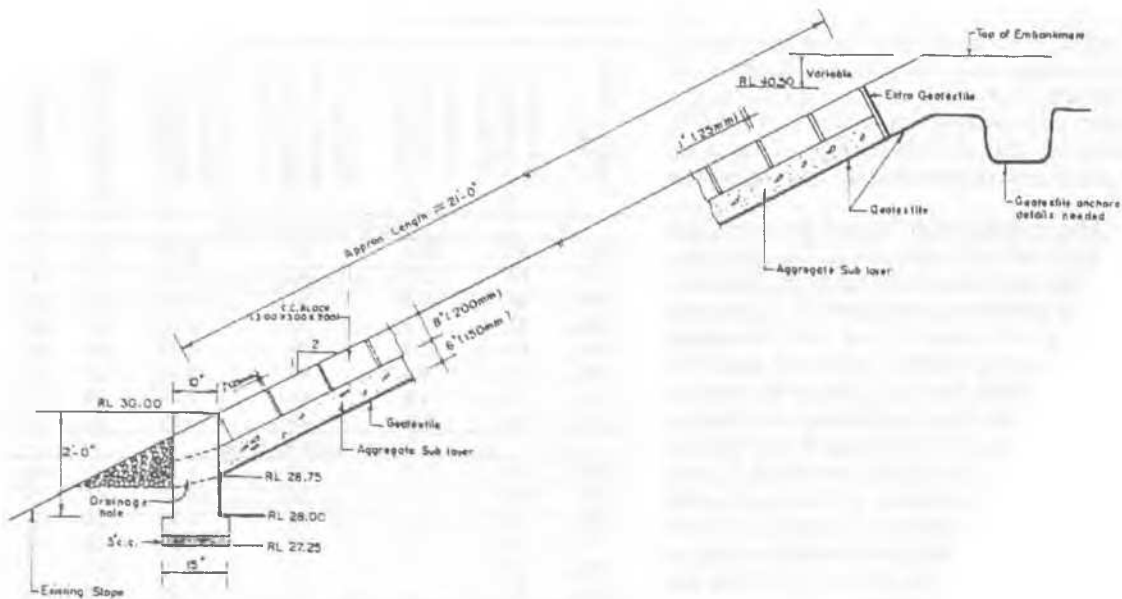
Suggested typical section of permanent protection works for railway embankments.
